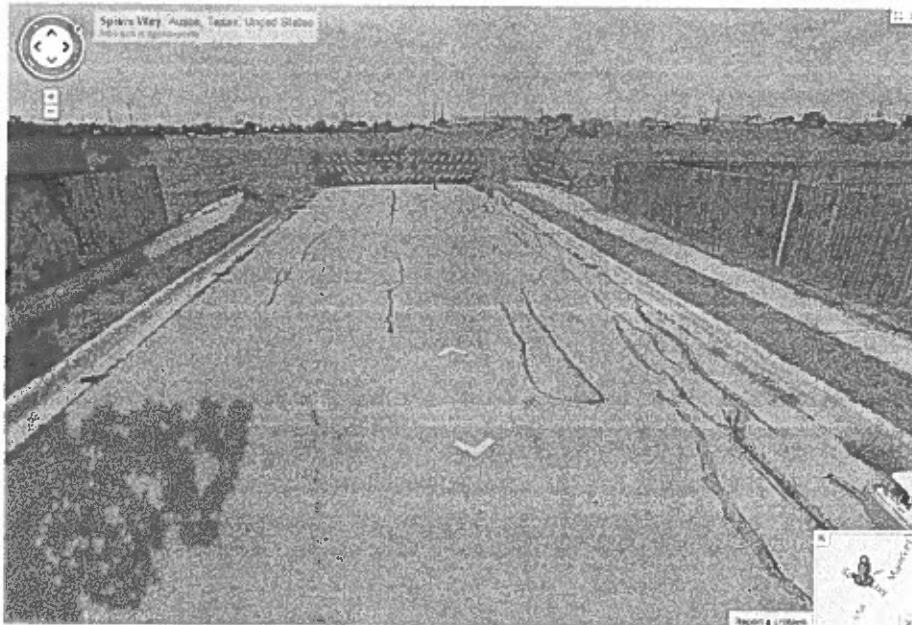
Google photograph of the Spiers Way stub street looking into the proposed subdivision and toward the Del Valle Elementary School.
